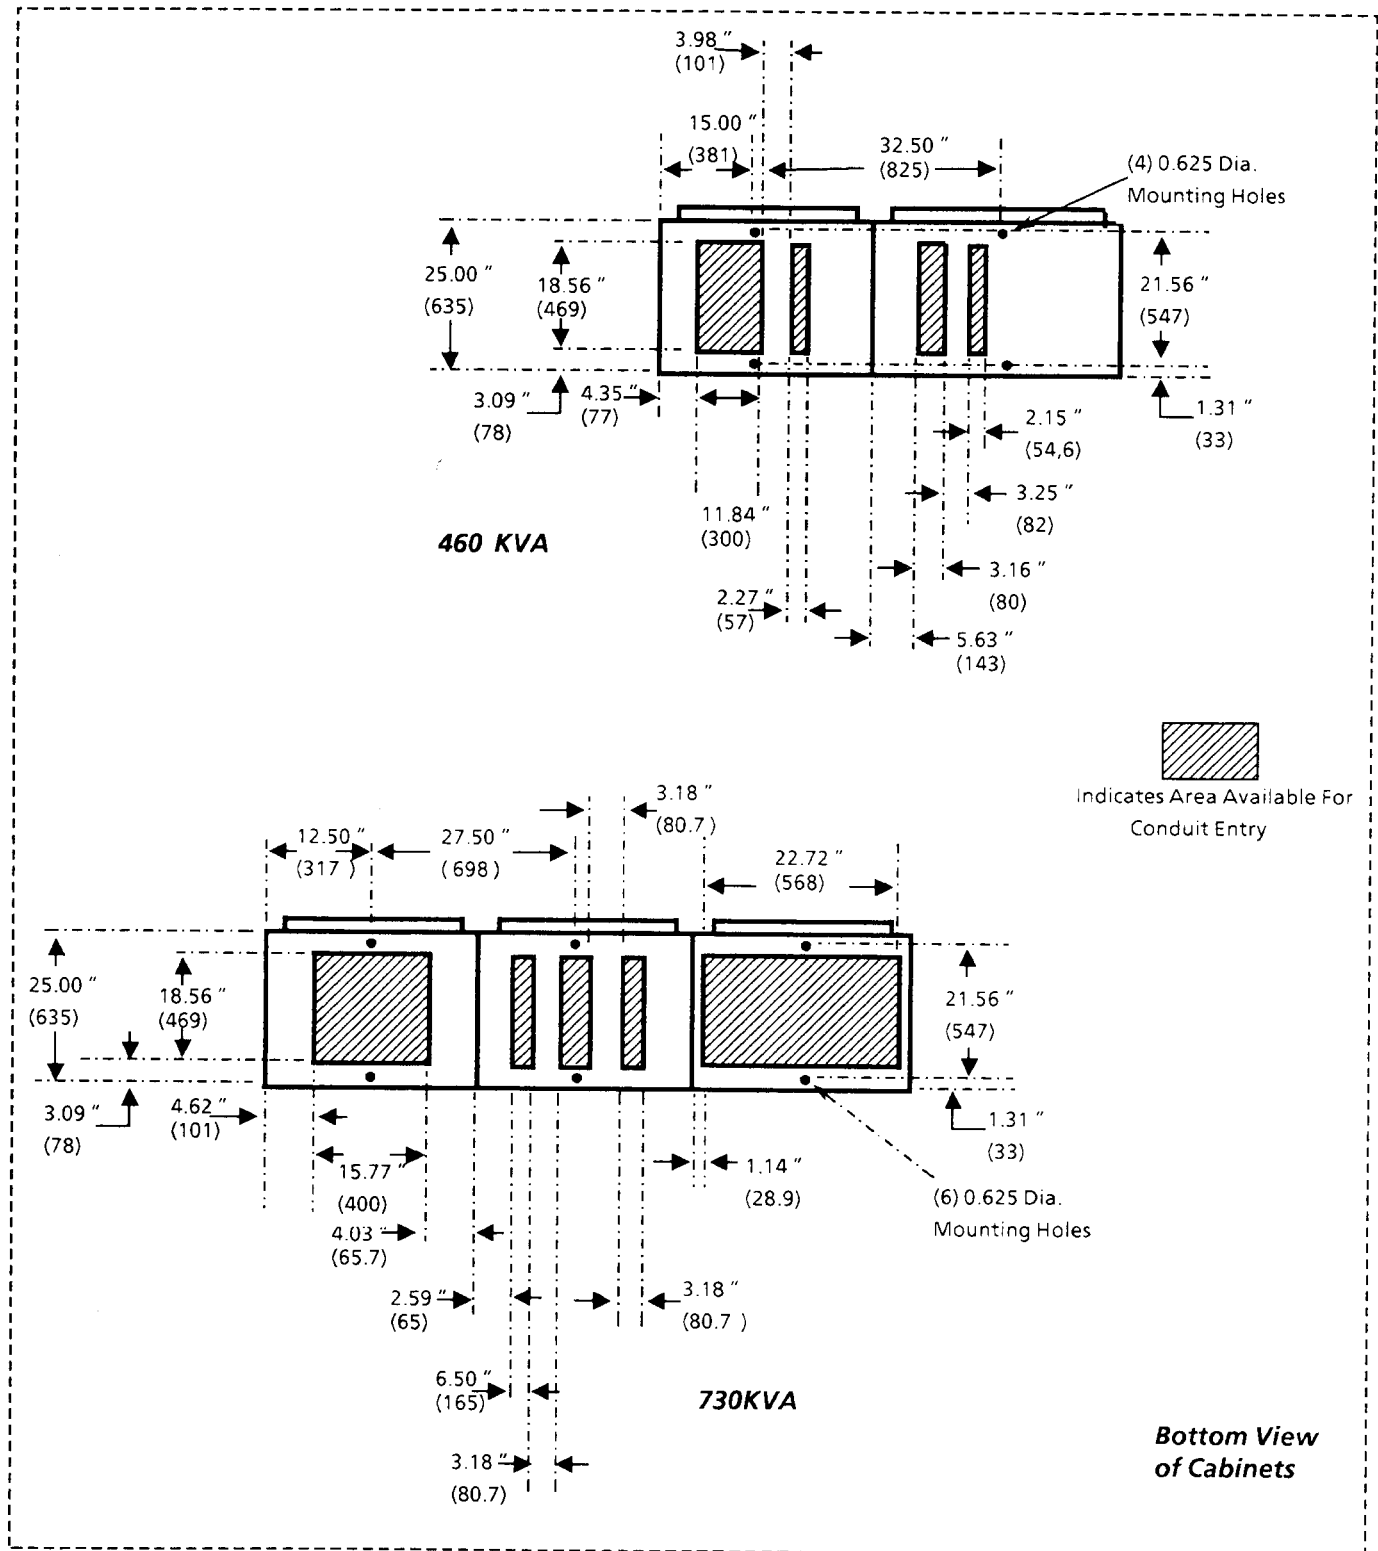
460 - 730 KVA Conduit Exit Dimensions
